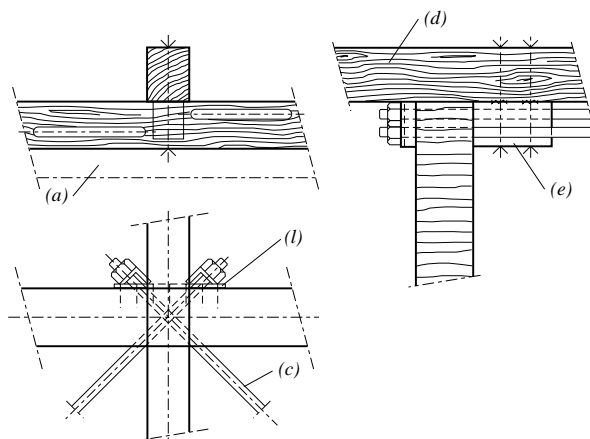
Connection of steel diagonals on the rear side of the chords. (a) Braced beam, (l) nailed steel fitting, (c) steel rod, (d) purlin, (e) connection with timber block and fasteners. (STEP 1995 Article D9)
